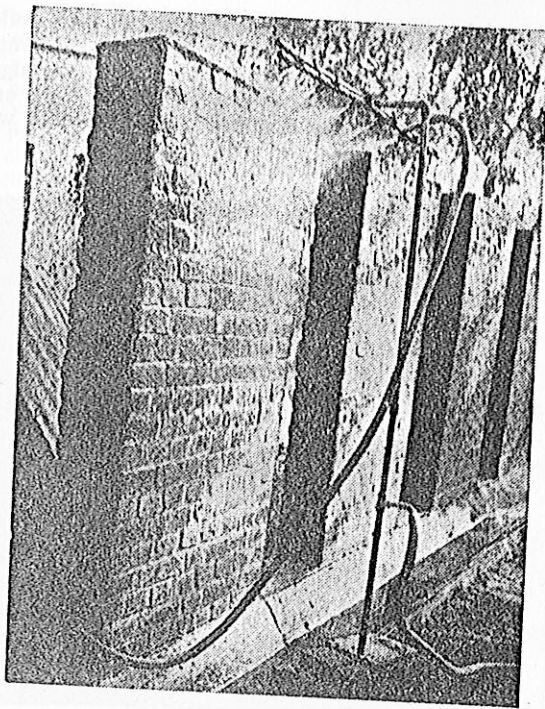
Artificial rain penetration test on full size brickwork masonry walls constructed with cement and lime surkhi mortar joints
